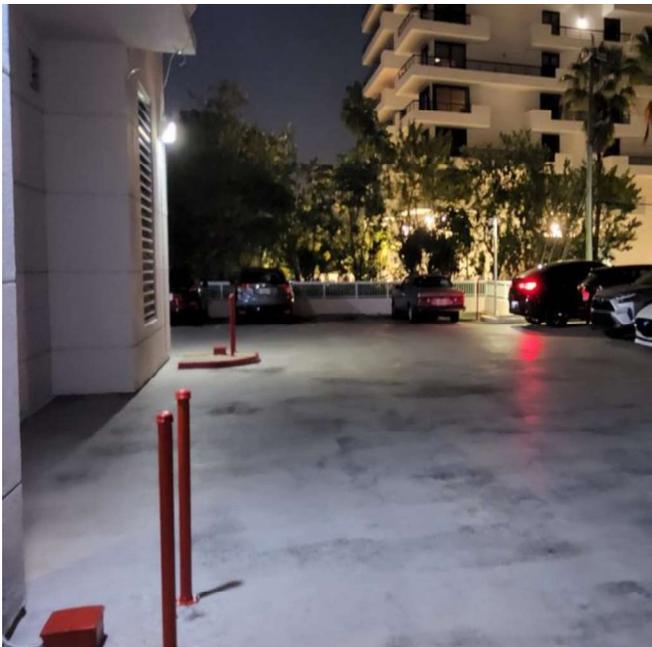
Item 24.2. Level 1 - Open parking, Fc = 9.7.
